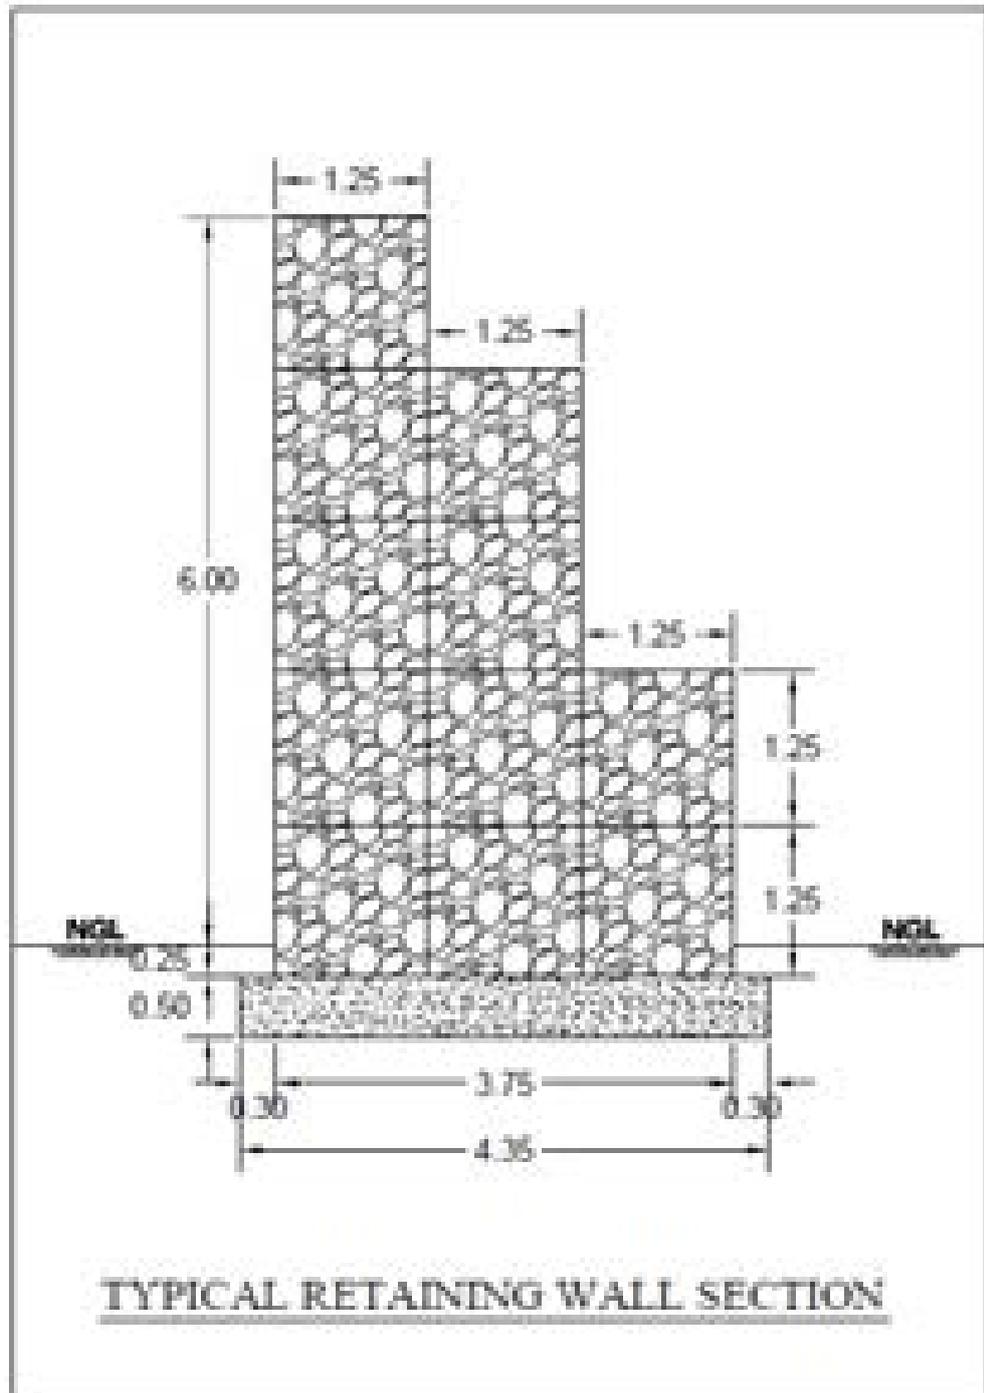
Cross Sections of the proposed retaining wall of muck dumping yard
